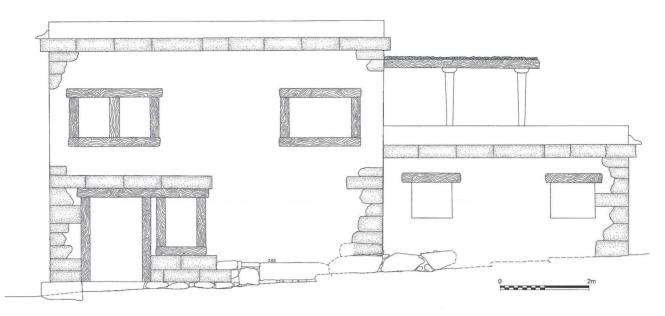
House C.1, Reconstruction of West Façade (drawing by J.F. Roberts).
